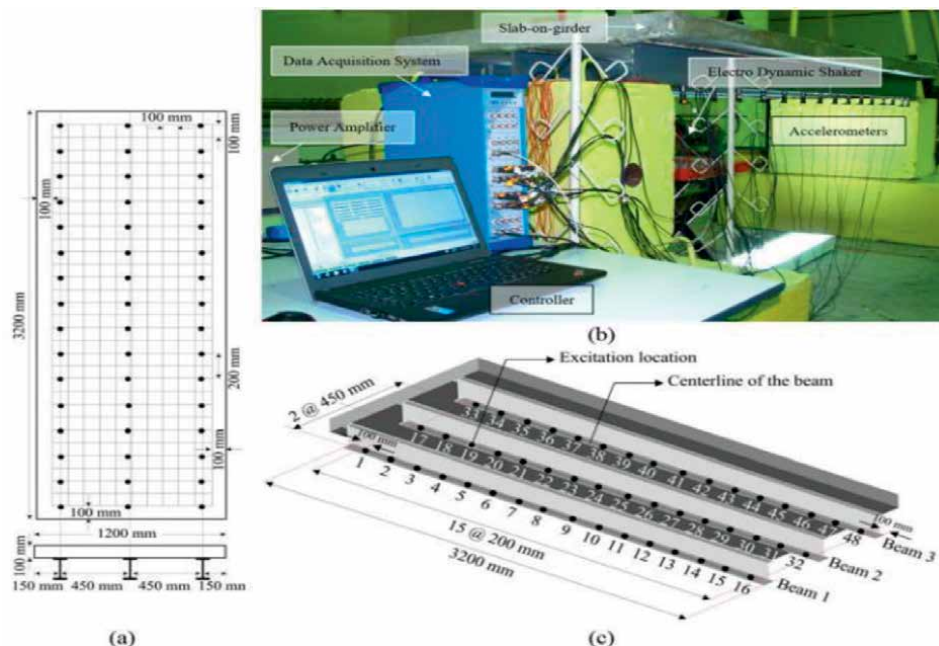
SHM technique to detect bridge damages using vibration test method as (a) schematic view and dimensions of the slab-on-girder bridge, (b) experimental setup of the test and (c) the arrangement of the accelerometers and the excitation point.
